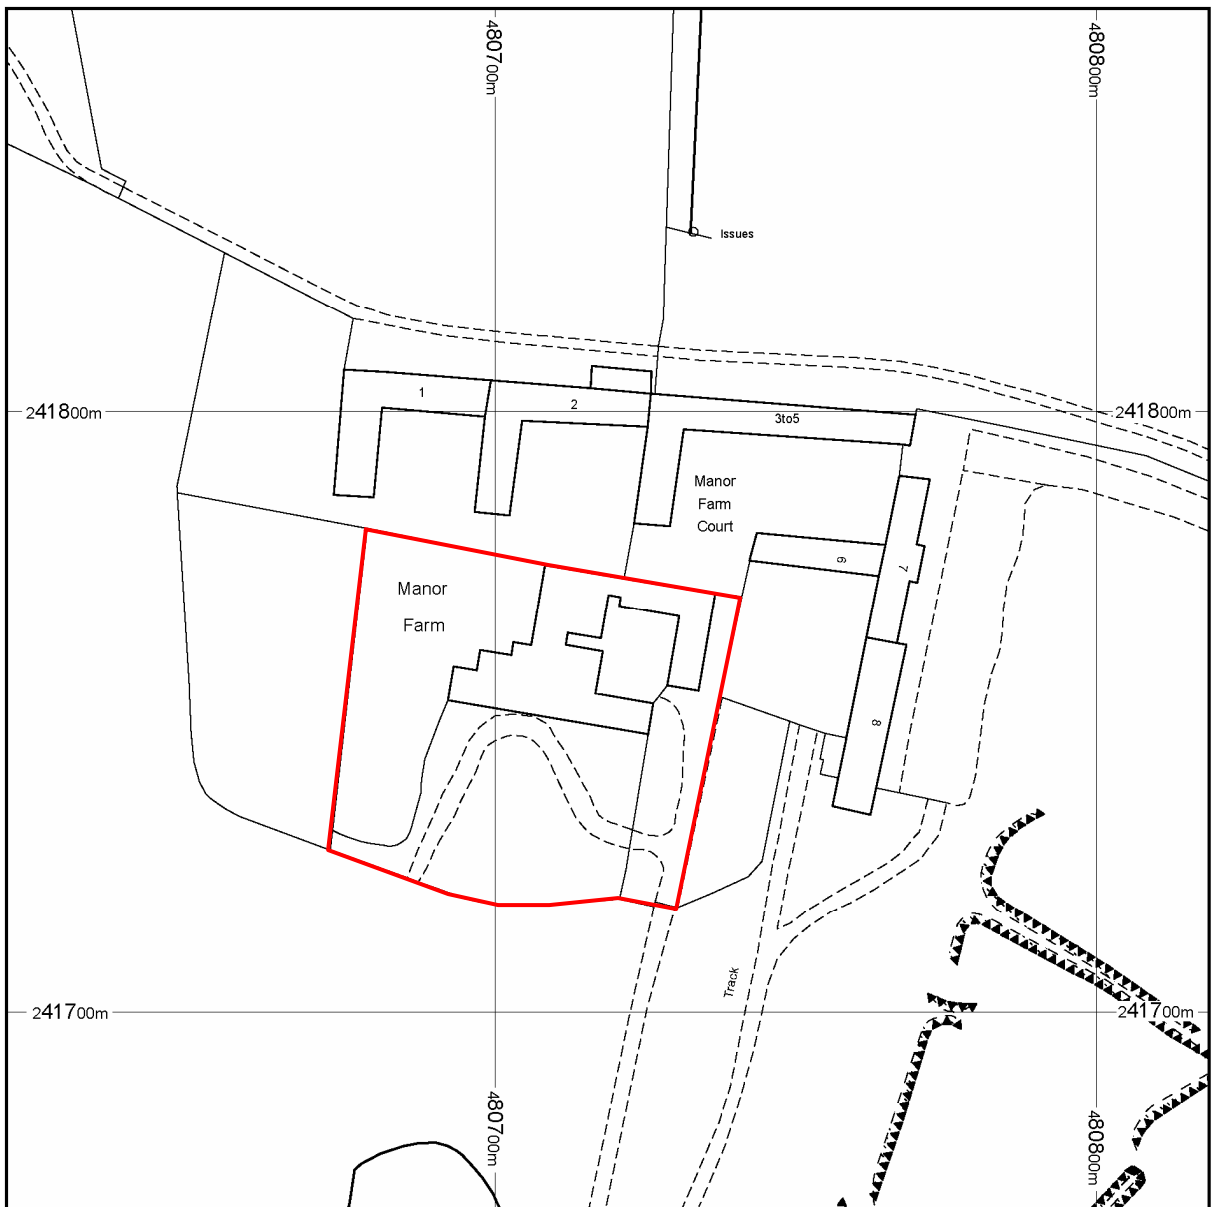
Site plan, showing area affected by present proposals (scale 1:1250)
